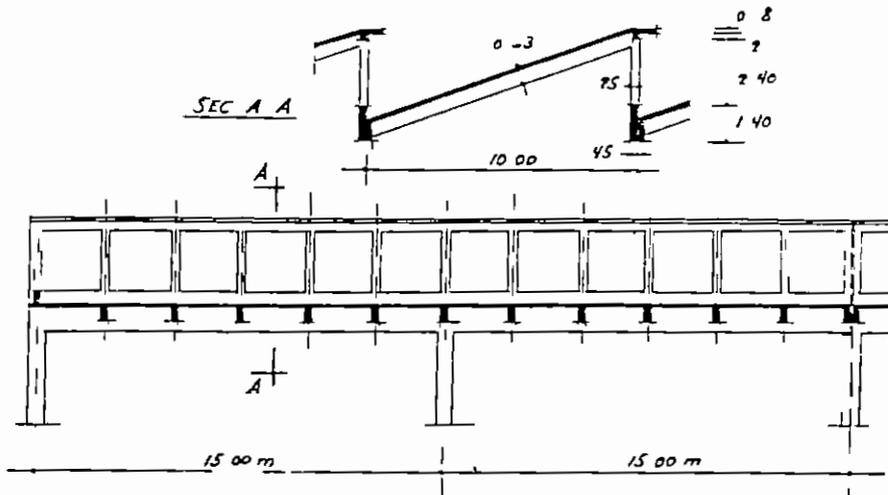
Cross and longitudinal sections of factory 135 at Helwan
